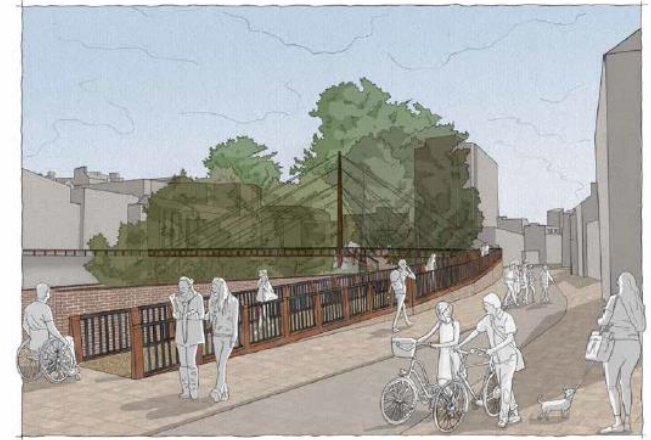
Concept sketch of option 2, showing the proposed ramp and narrowing/ resurfacing of the North Street carriageway.
